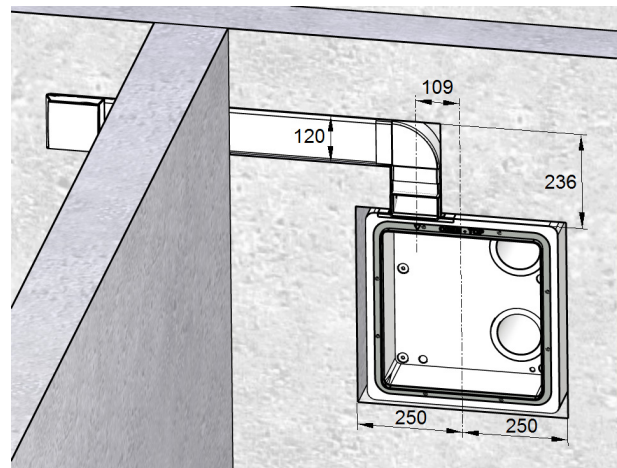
Flat ductwork layout example, dimensions in millimetres
